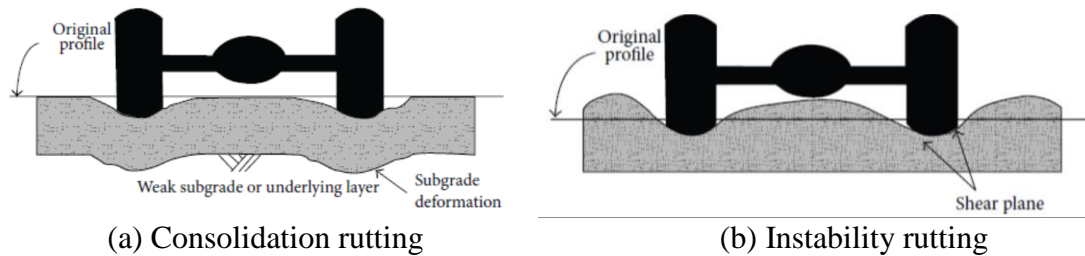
Two common types of pavement rutting diseases (Harvey et al., 2001)
